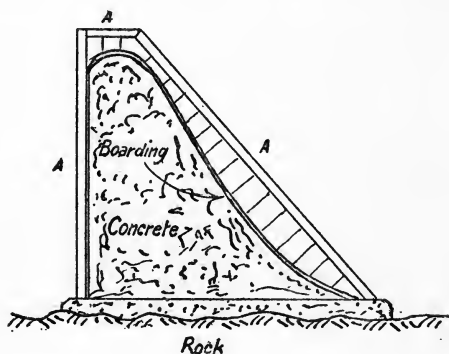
Diagram showing how the Concrete Dam was formed. Steel beams as at *A, A, A* formed frames, at intervals, from which short steel props supported boarding, which formed a complete box. The concrete was filled into this box, and when set, the frames and boarding were removed.
